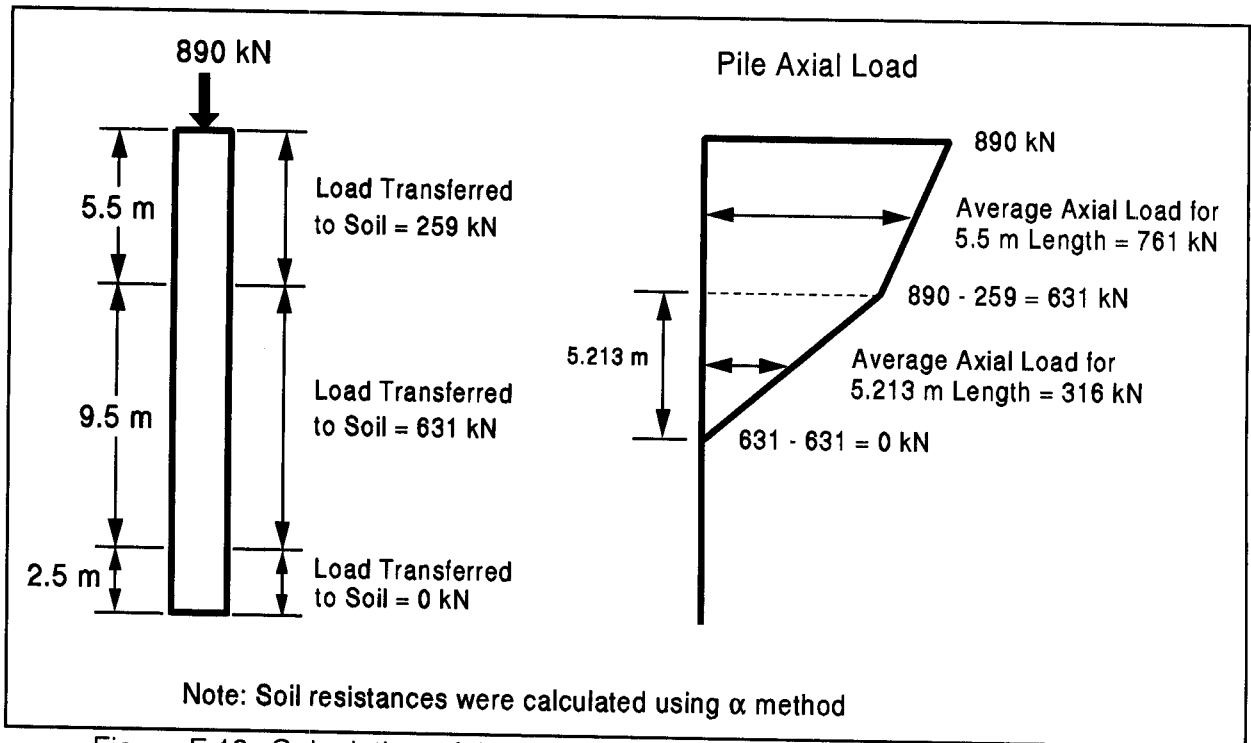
Calculation of Axial Load Transfer to the Pile at South Abutment
